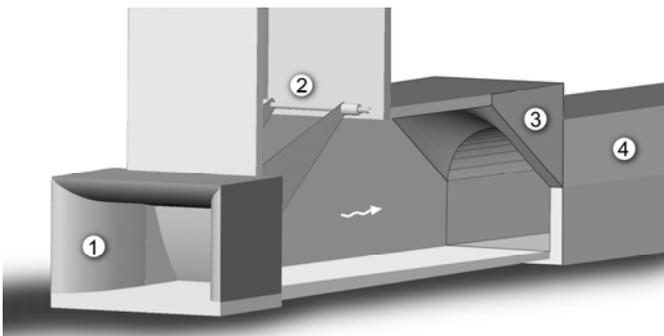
Bypass tunnel intake with (1) inlet trumpet, (2) tainter gate chamber, (3) shape distortion, (4) archway tunnel section.
